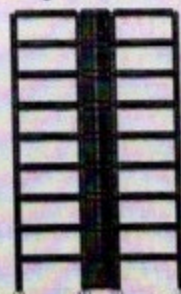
(b): Elevation of shear wall without openings in high rise structure.
